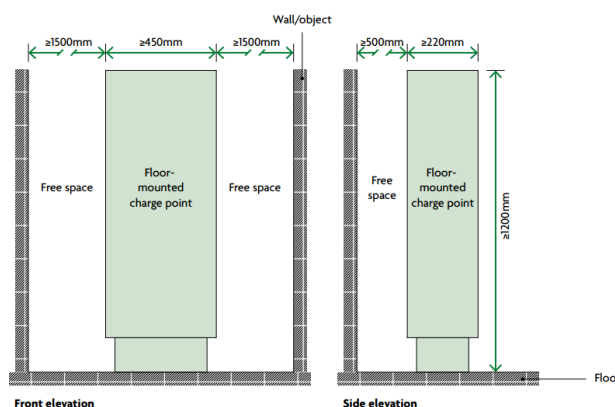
Minimum space requirements for floor mounted charge point location (source Gov.uk¹)
